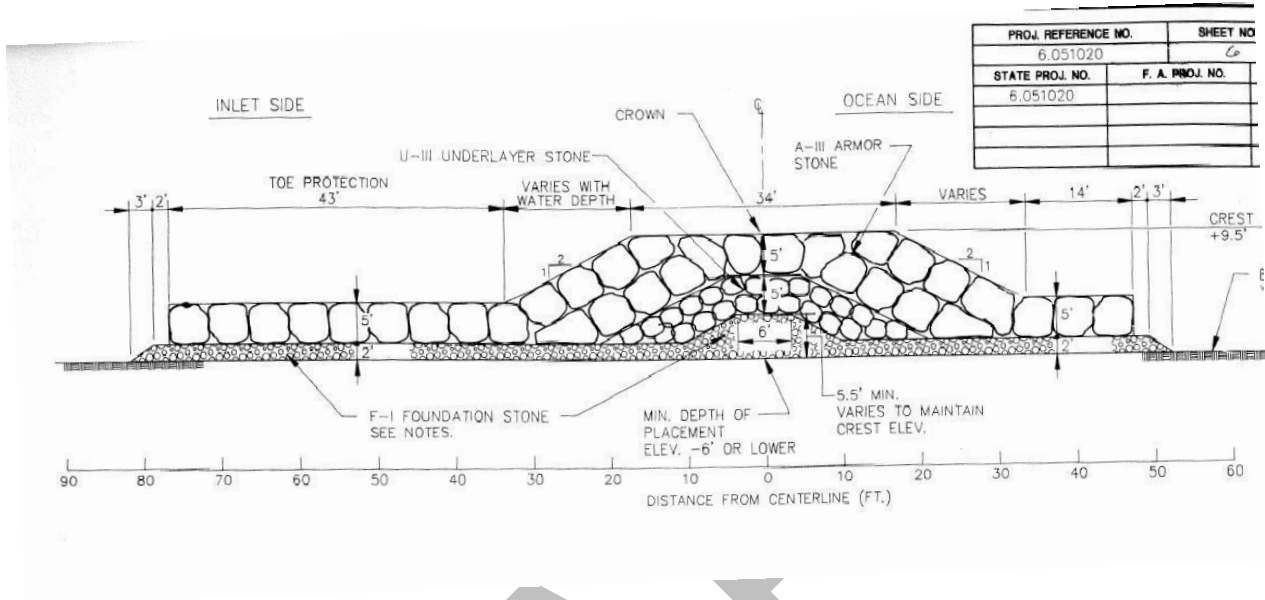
Oregon Inlet Terminal Groin Typical Cross-Section
